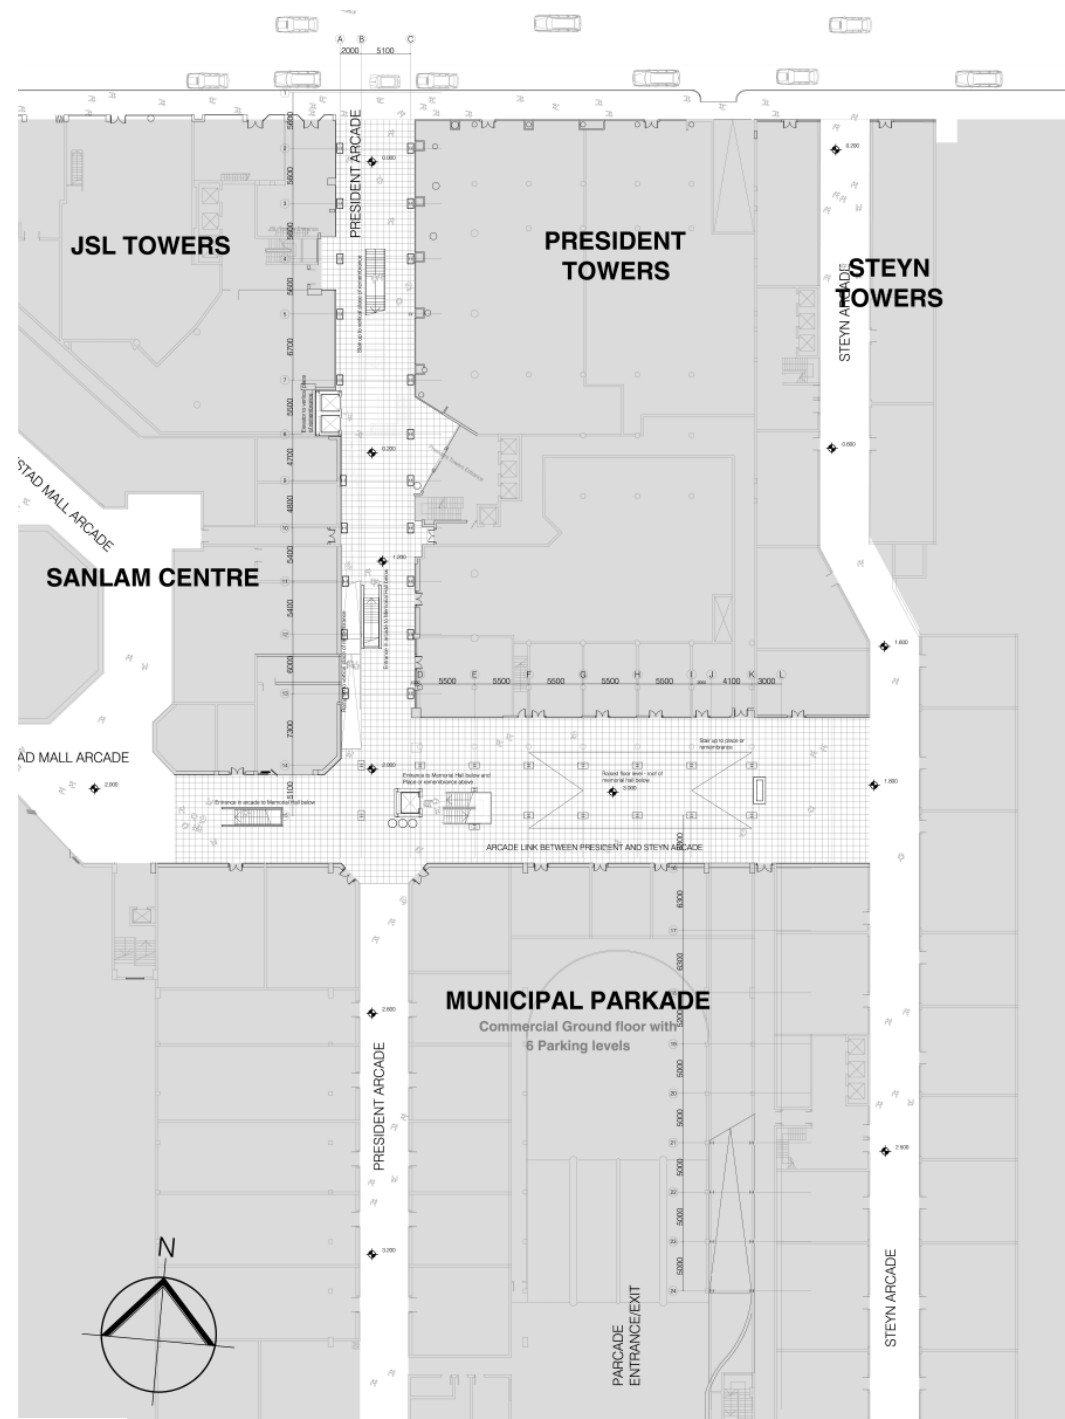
The ground floor plan showing the arcade and the connections between the memorial space below and the place of remembrance above (Author, 2011).
